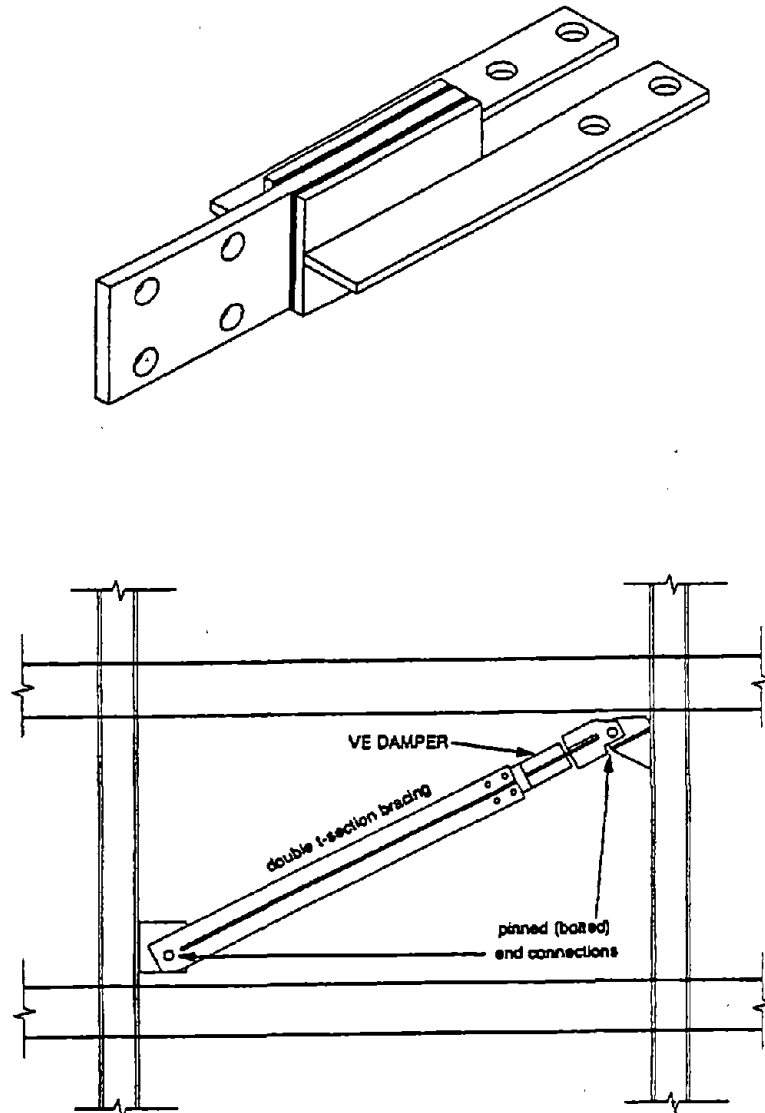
Viscoelastic damper and installation (after Aiken et al., 1990)
